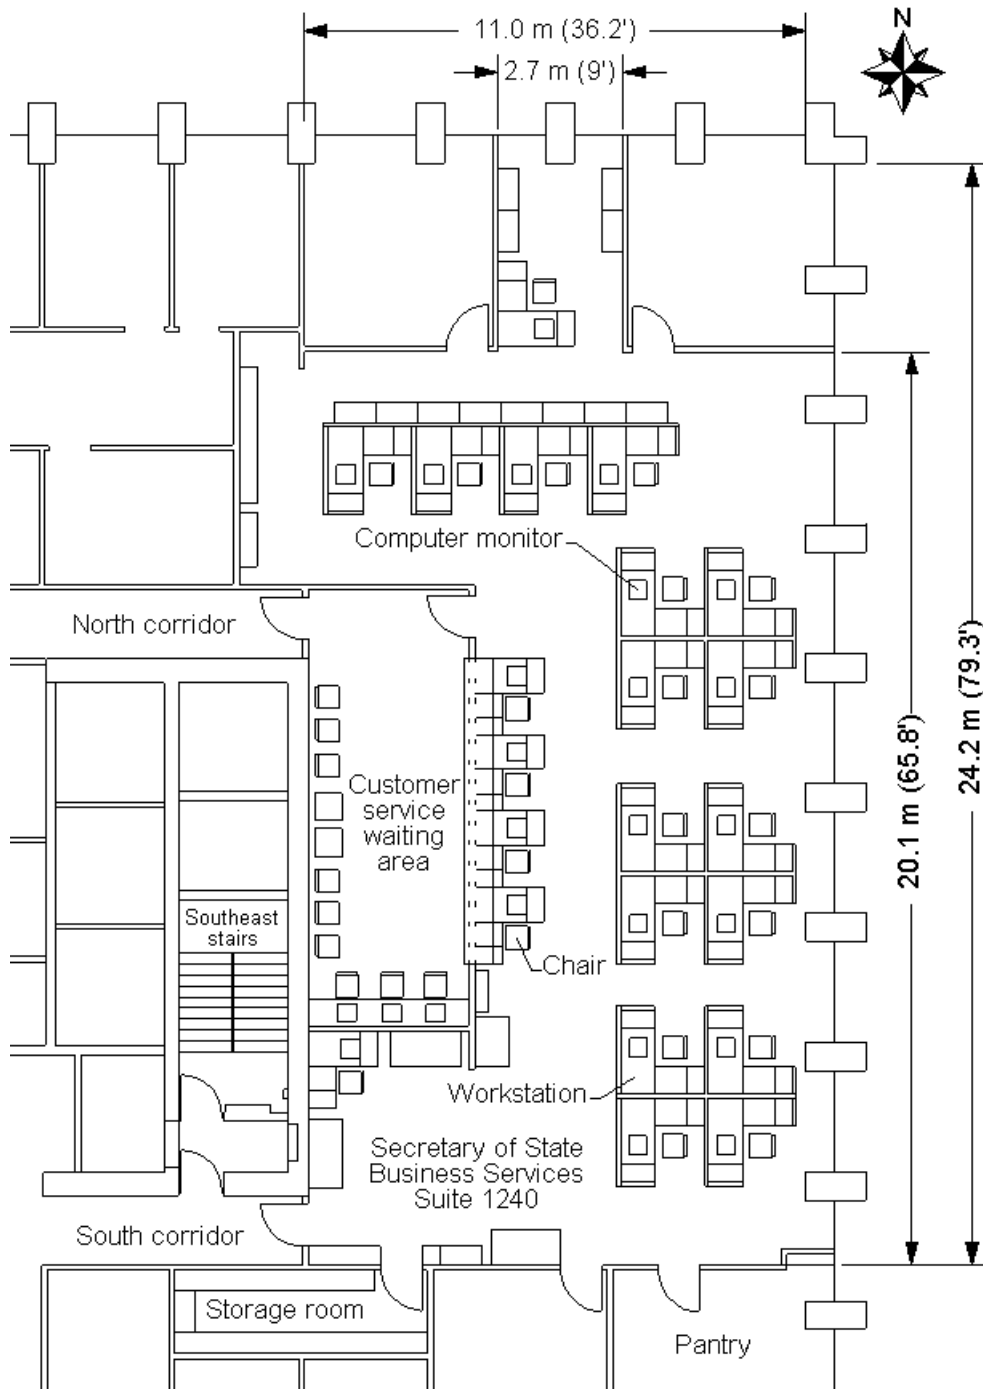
Plan view of Suite 1240 depicting furniture arrangement
